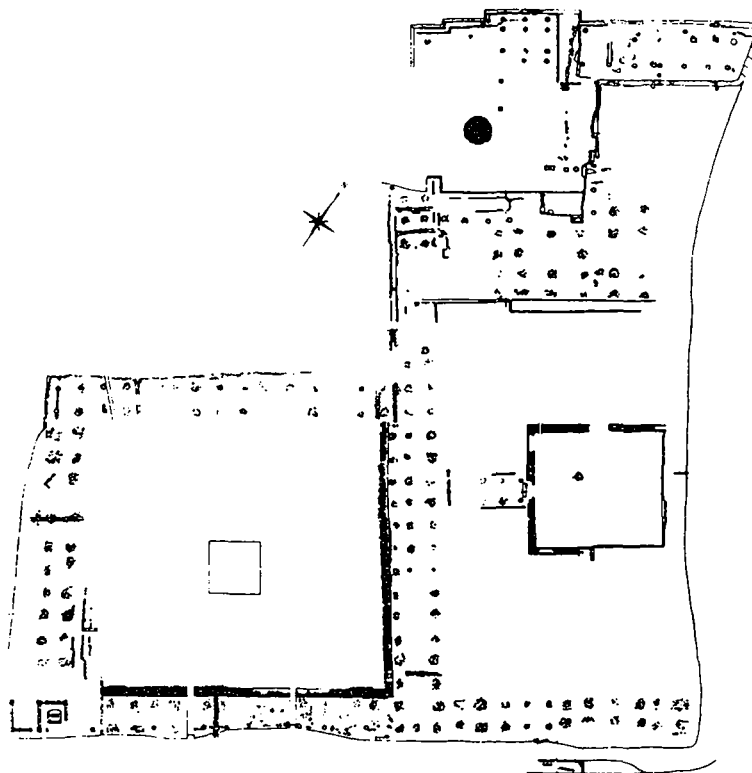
Excavation plan of Ko-sŏn-sa 高仙寺 고선사 (late 7th C. AD, scale: 1 : 1,000)
